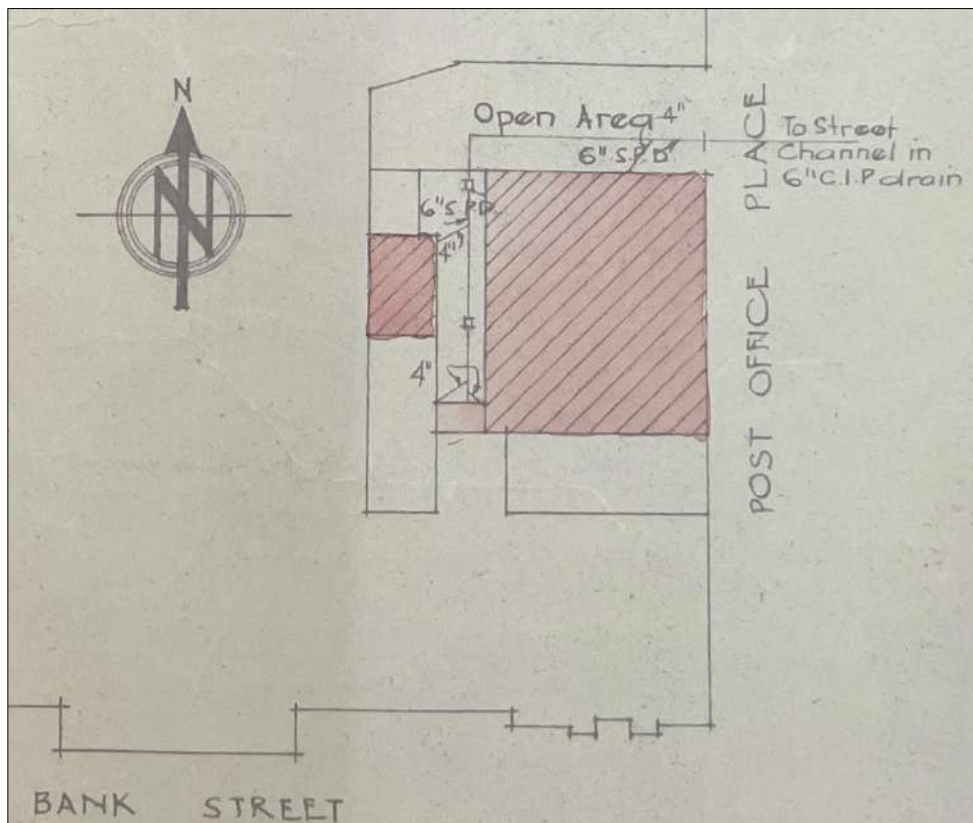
A c1936 block plan showing the location of the Council rates department addition, designed by Oakley & Parkes. Note: Post Office Place was later renamed Layfield Street. Source: Public Records Office Victoria.
